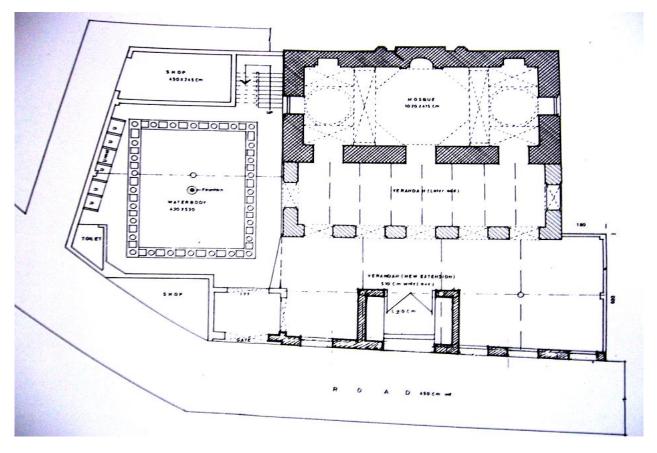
Proposed recommended plan (measured drawings)
